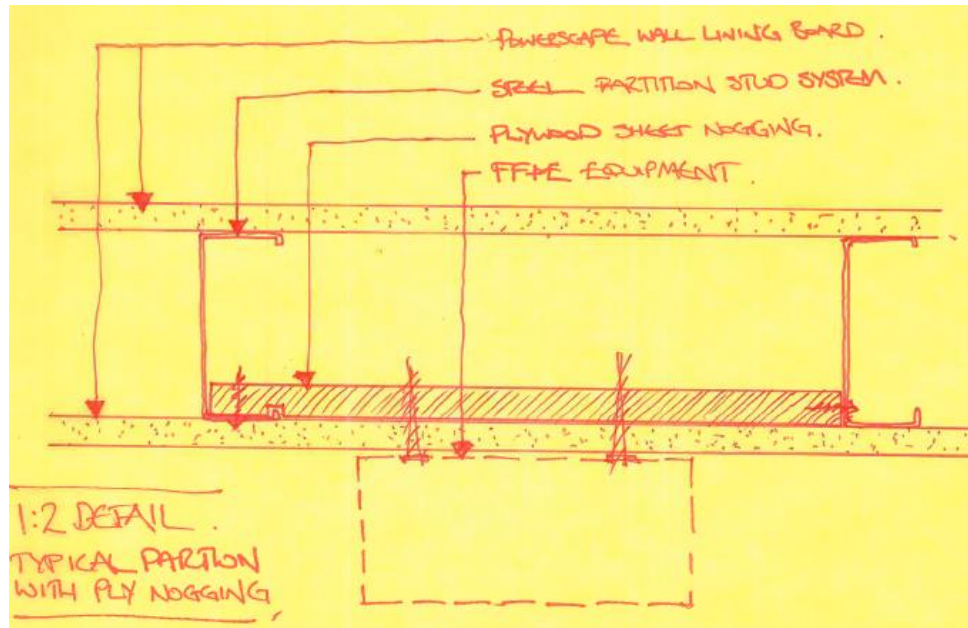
Section view of smoke wall from top (plywood timber nogging within wall shown as hatched area)
